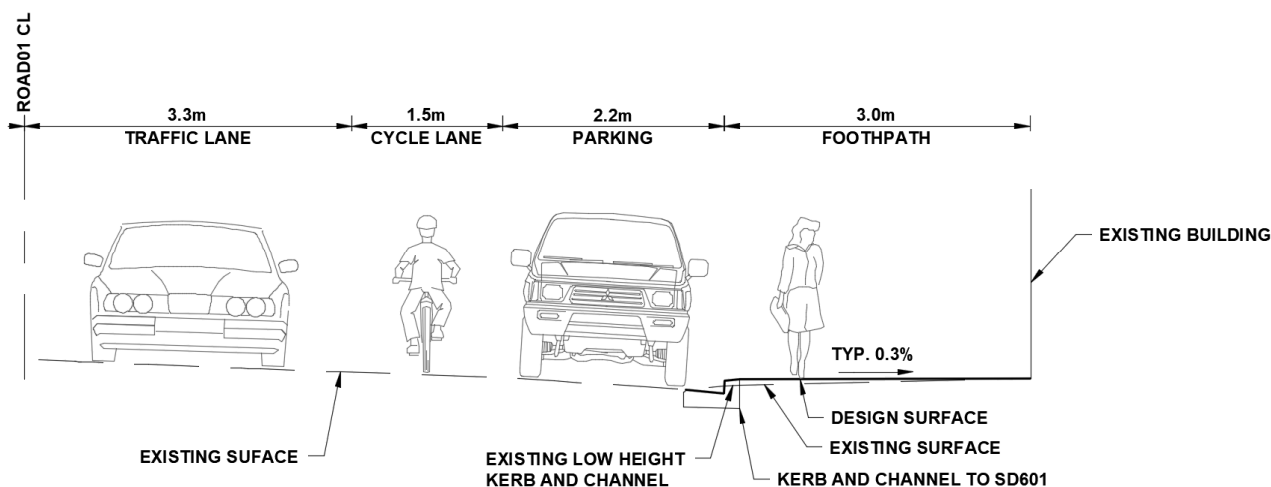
Edgware Road Typical section of the South side existing low-profile kerb replaced with full-height kerb at existing fender level
